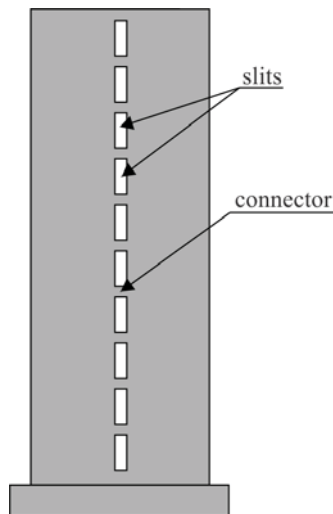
Cast-*in situ* slit wall with a slit zone with short connections (Kwan *et al.*, 1999).
